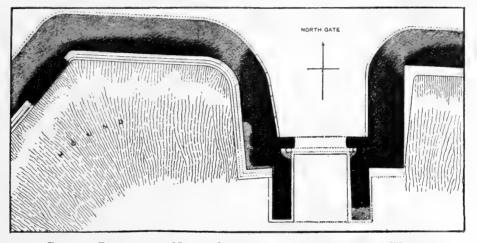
PLAN OF THE NORTH GATE AND ADJOINING SECTION OF WALL. (For scale, see plan of West Gate.)
